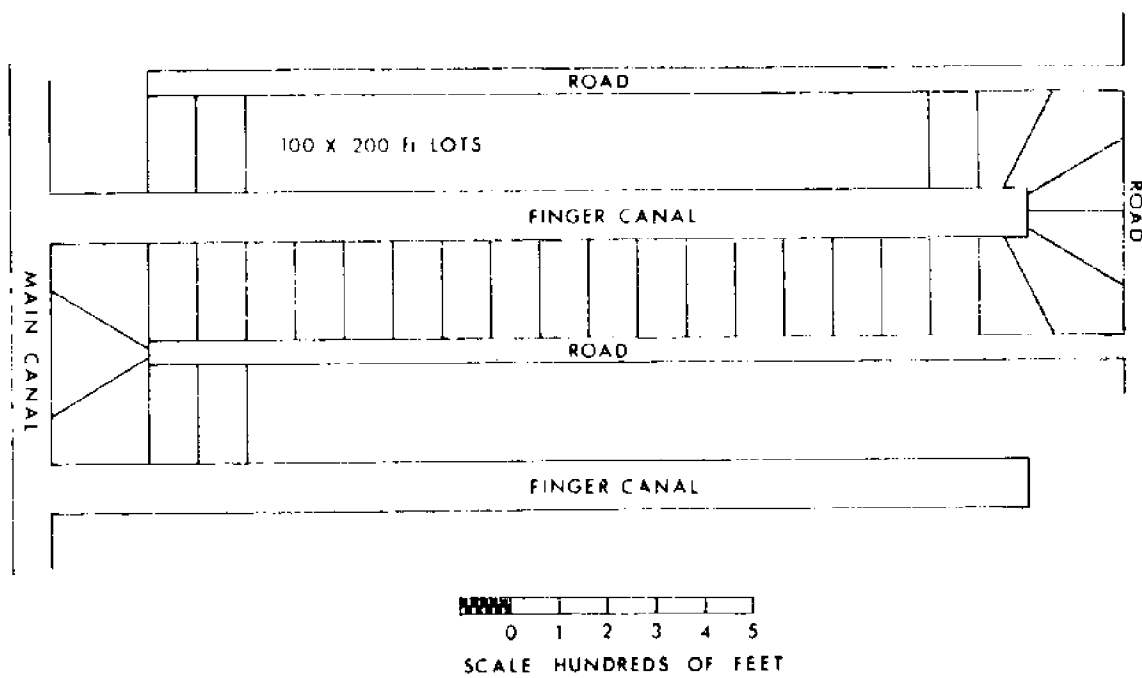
Typical Residential Finger Canal Arrangement.
